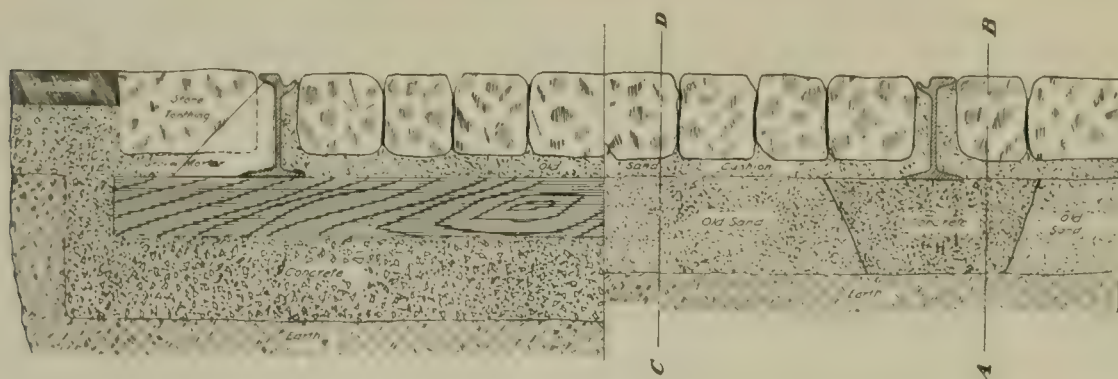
CROSS SECTION OF 9-IN. TRACK, BEAM CONSTRUCTION, STONE PAVING.
